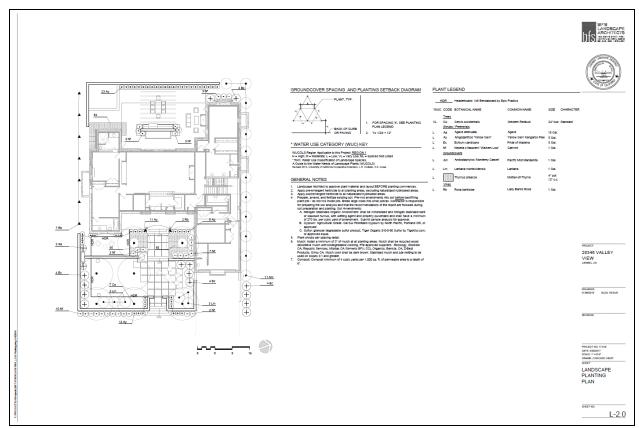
L-1: Proposed Landscape Planting Plan at 26346 Valley View Avenue
